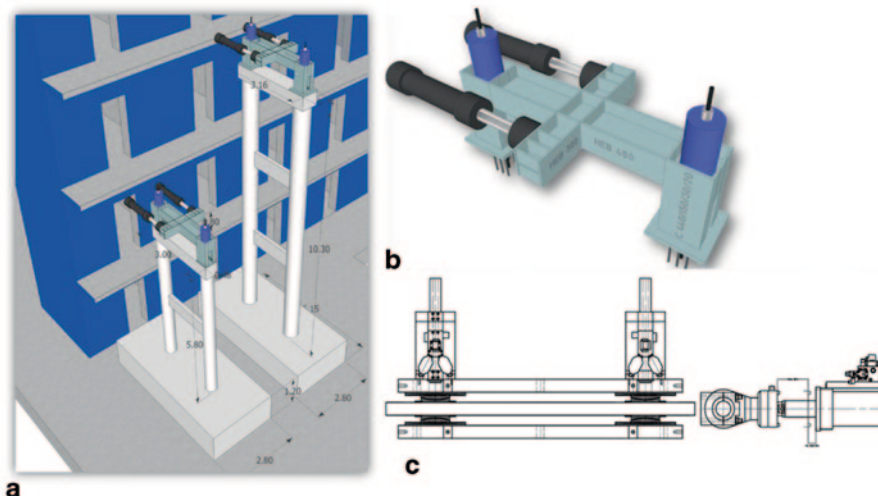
Test rig configuration: a the two piers to be tested, b the horizontal and vertical load systems and c seismic isolation setup
